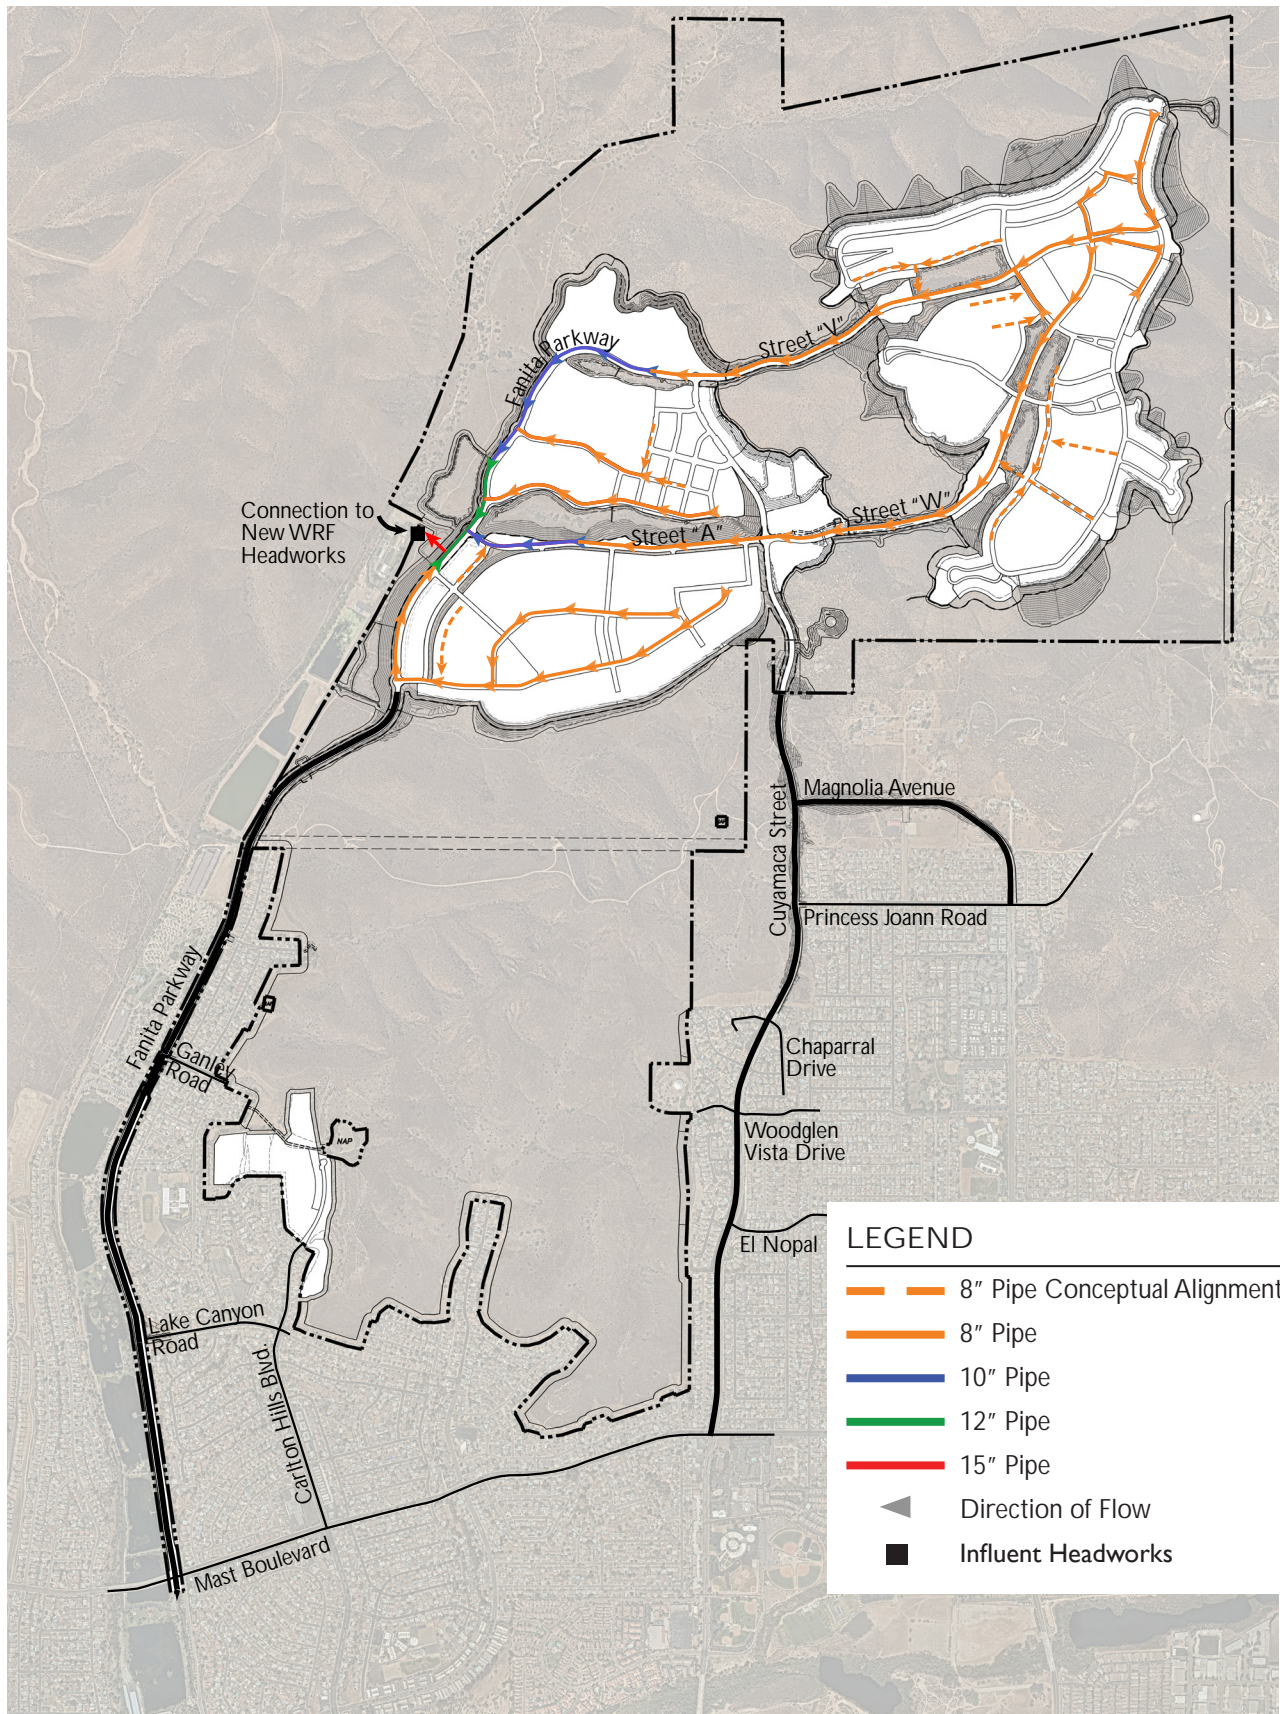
Conceptual Sanitary Sewer Plan
